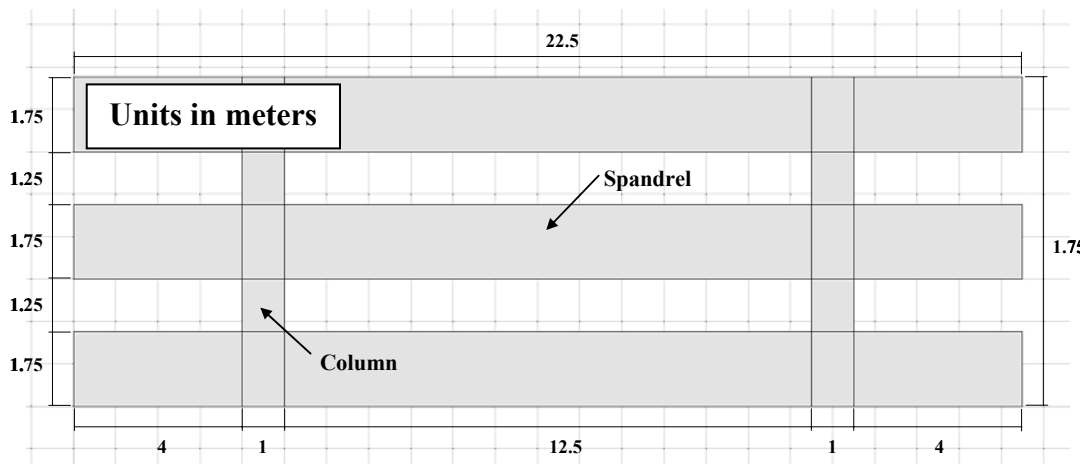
North-south elevation view of FDS model showing outer spandrels and columns.
